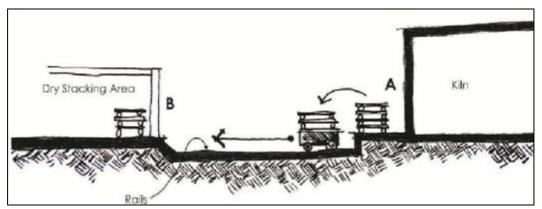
Diagrammatic explanation of elevated concrete base in relation to dry stacking area.
